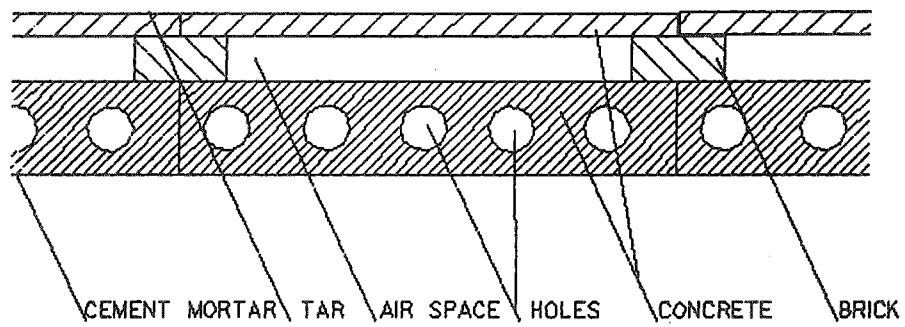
ROOF CONSTRUCTION IN URBAN HOUSING -- HENAN
